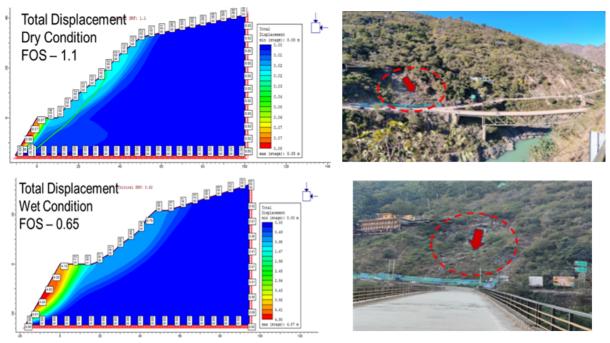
Slope Stability Assessment at Devprayag Bridge Site
